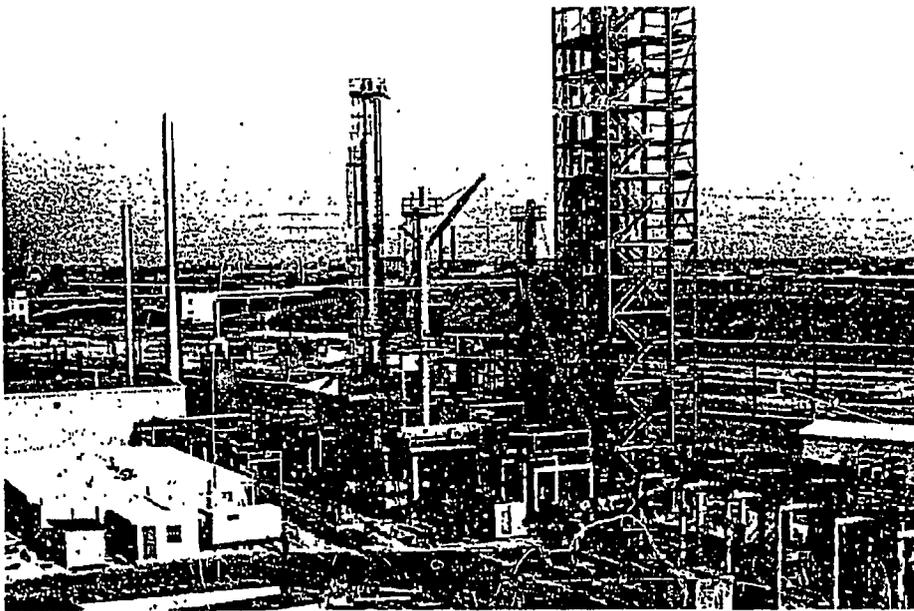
OVERALL PLANT LOOKING SOUTHEAST
